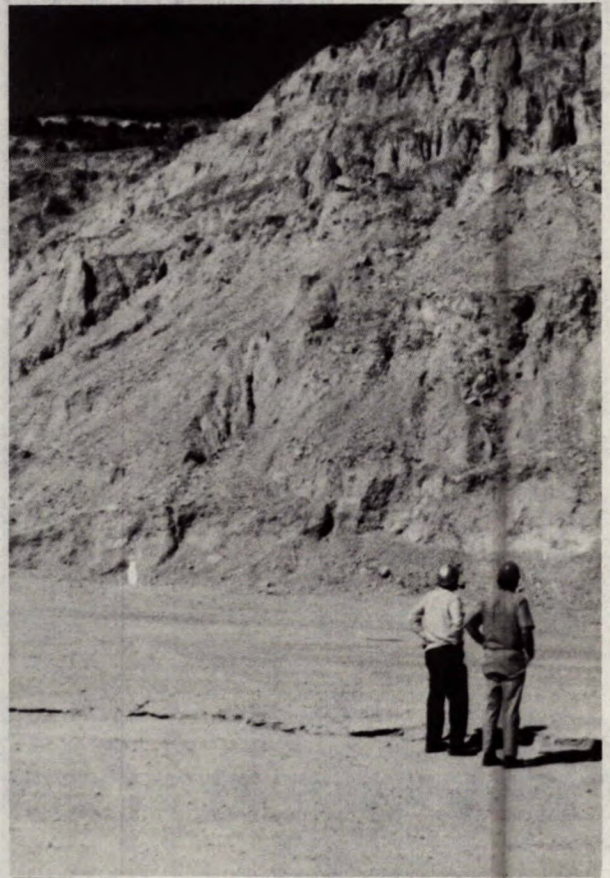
Cracking 100 ft (30 m) beyond the toe of a 300-ft (91-m) high wall
